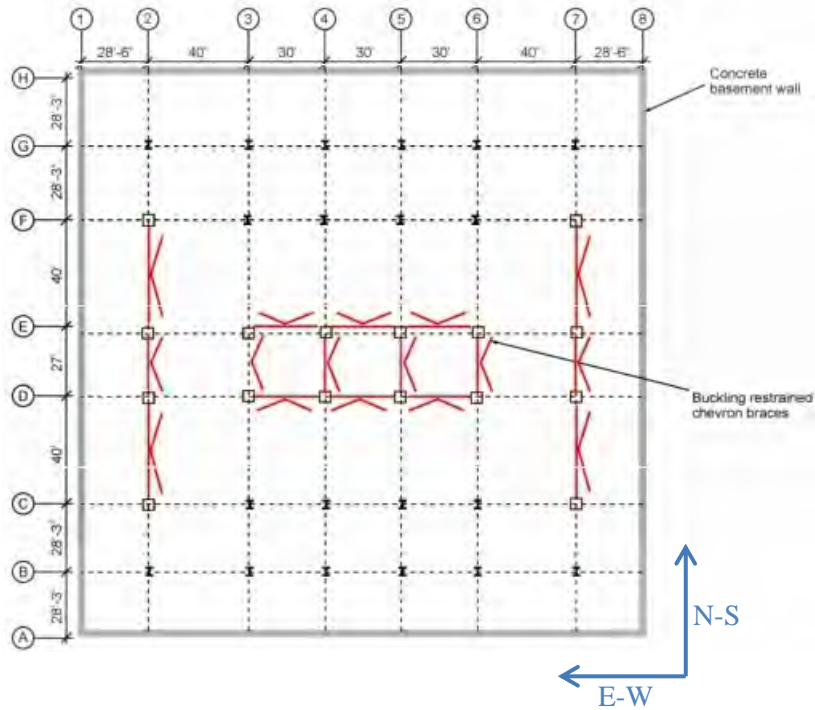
Plan at ground floor and basement (subterranean) levels for Building 3A. Buildings 3B and 3C are similar. Box columns are shown as squares and the gravity columns are shown as W sections (I symbol). BRB bays are shown in red. The grey walls at the perimeter indicate the concrete basement walls. For the four subterranean levels, the walls are specified as 18 in. thick for the two highest and 24 in. thick for the two deepest. Image courtesy of Dutta and Hamburger [2010].
